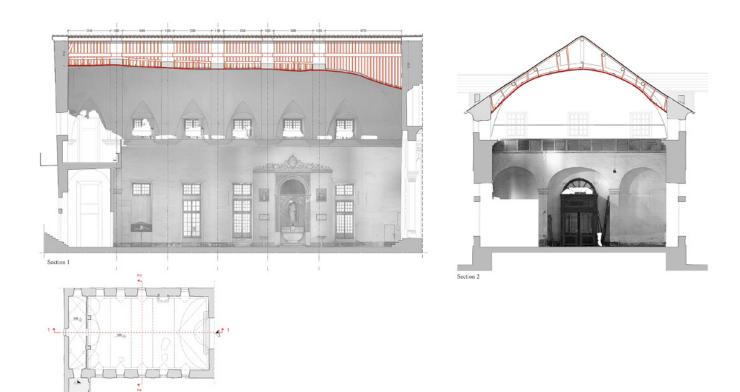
The roof structure's current configuration; longitudinal and cross sections.
